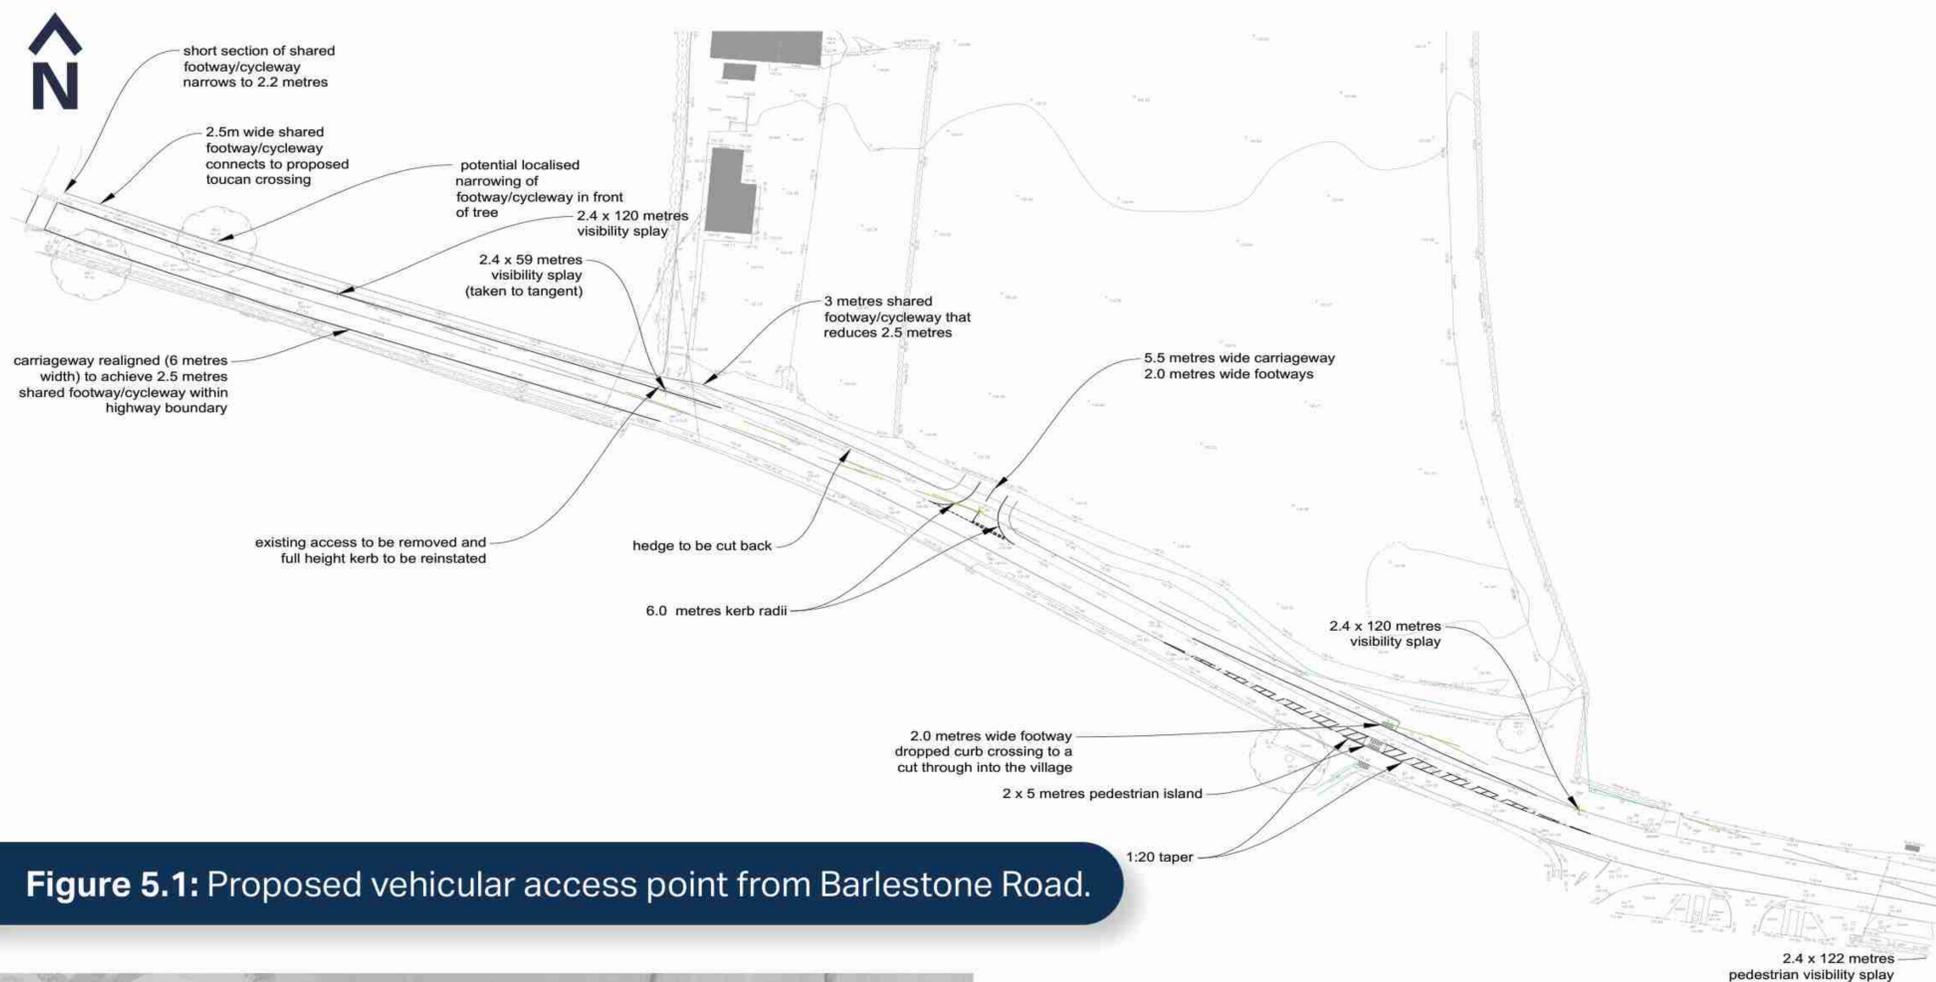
Proposed vehicular access point from Barlestone Road.
